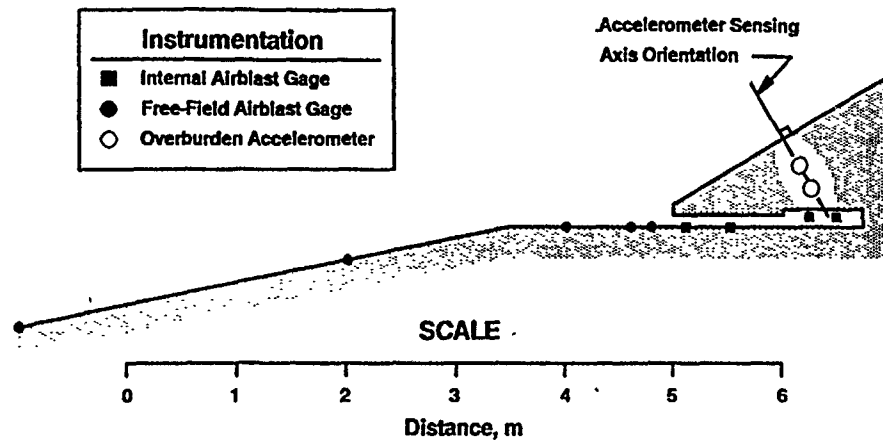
Layout (centerline profile) of 1:25-scale WES Brick Model.
